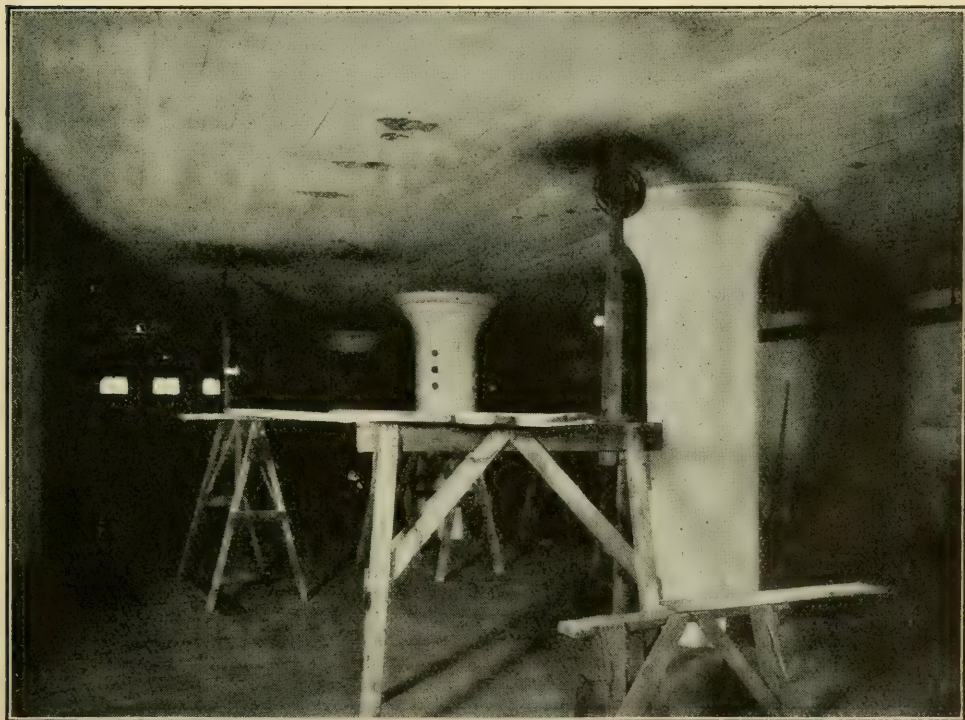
UNDER SIDE OF TEST PANELS, NORTHWESTERN GLASS COMPANY BUILDING, MINNEAPOLIS.
